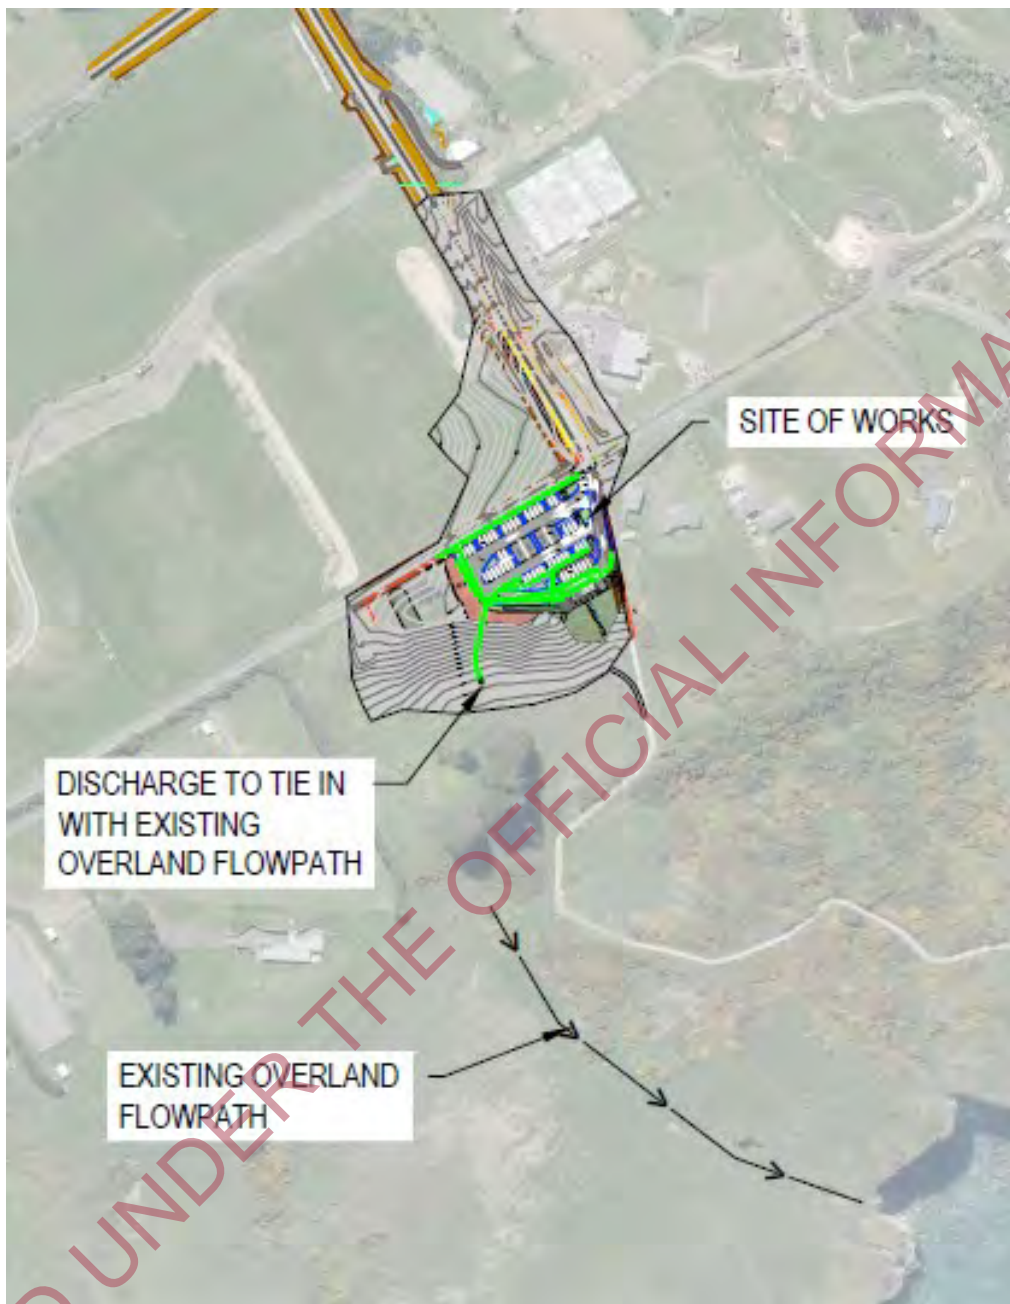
Location of existing overland flowpath where any excess stormwater drainage would be directed towards.
